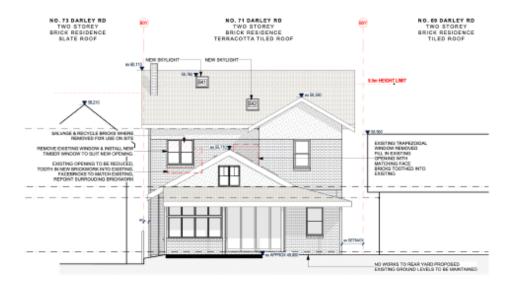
Image of rear façade of proposed dwelling and the immediately adjoining structures.
